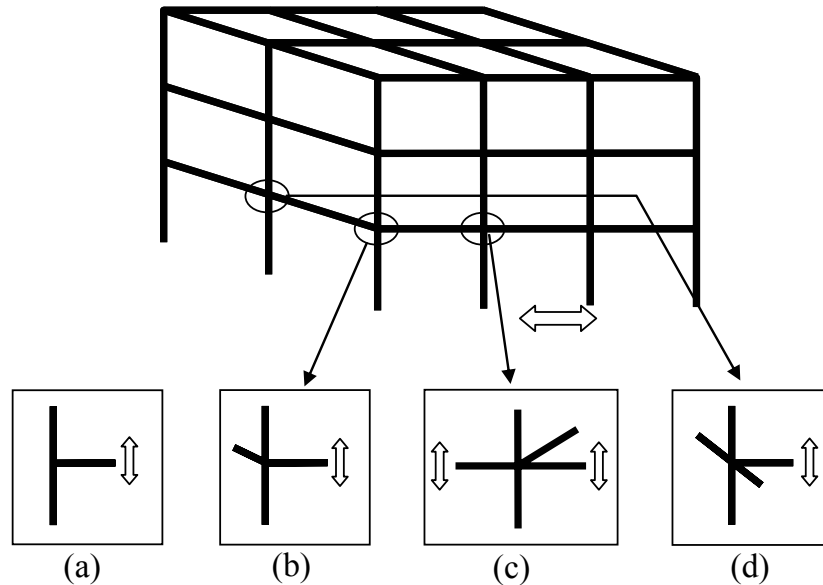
Beam-column joint types: (a) exterior joint, (b) corner joint, (c) interior joint, and (d) exterior joint with two transverse beams.
